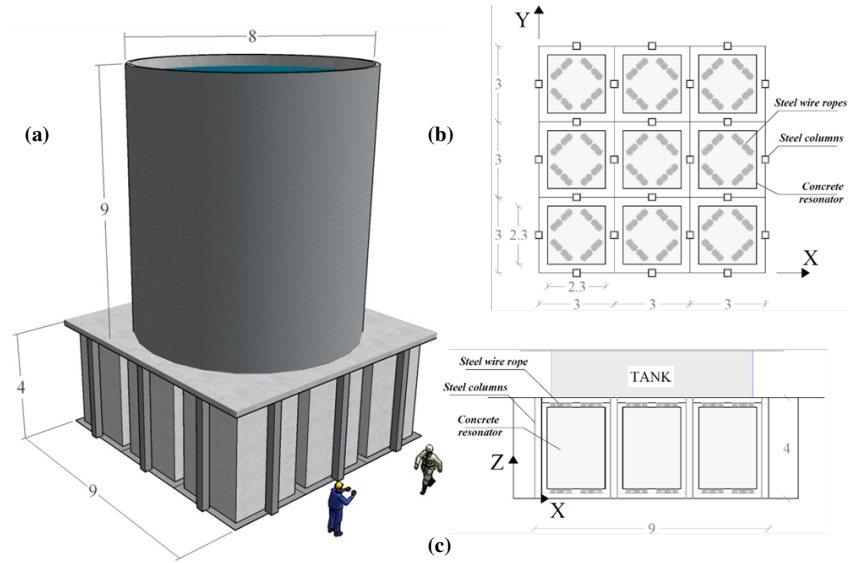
Coupled foundation - tank system: (a) 3D view, (b) layout of the unit cells and (c) cross section of the metafoundation. Dimensions are in m.
